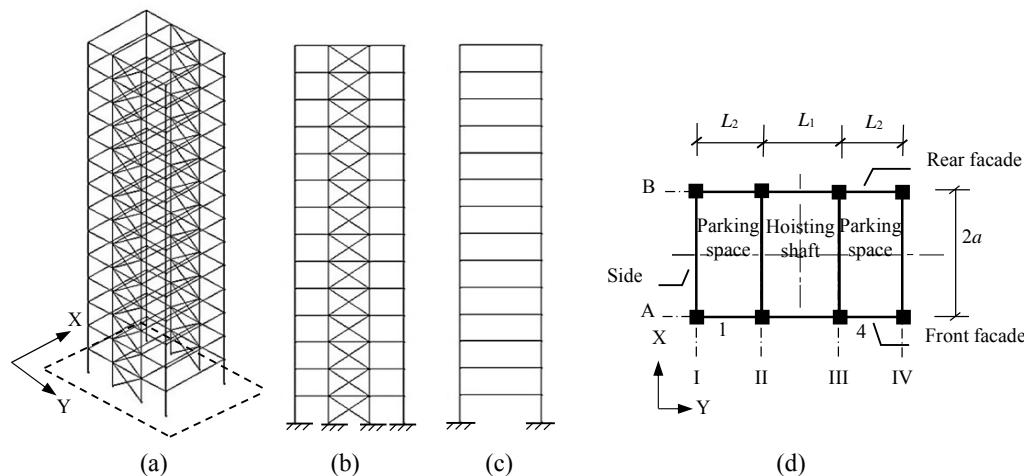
Conventional Highrise Vertical Lifting Tubular 3D Parking Structure:
